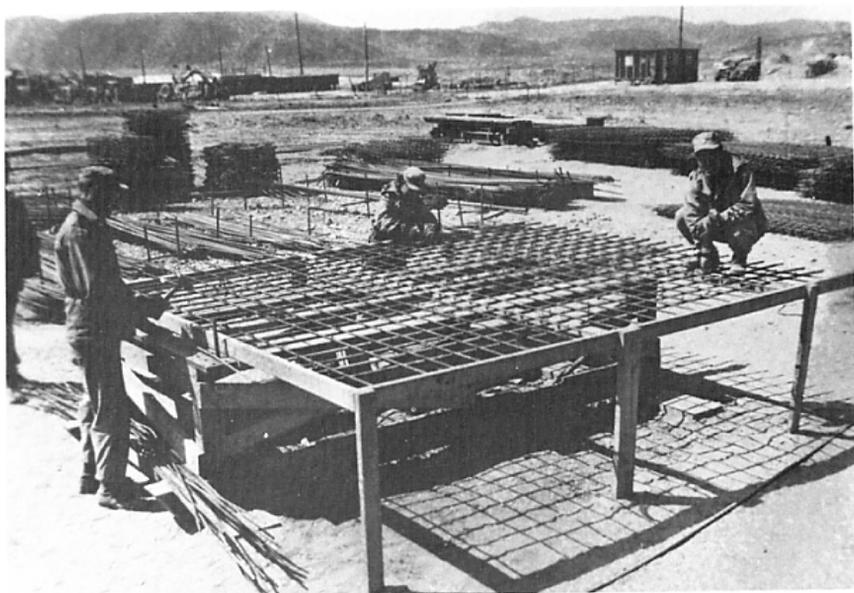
Steel mats that would reinforce the bridge decking being fabricated in the central work yard.
